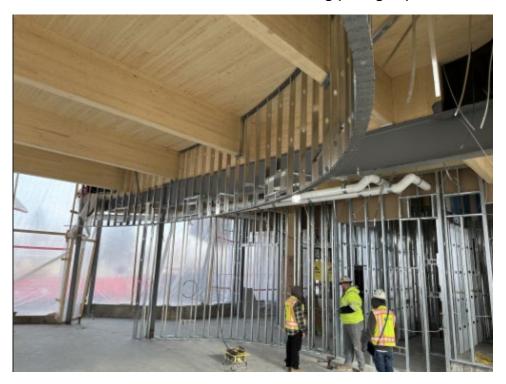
Stairwell at Level 1 with MEP Supports and Framing
